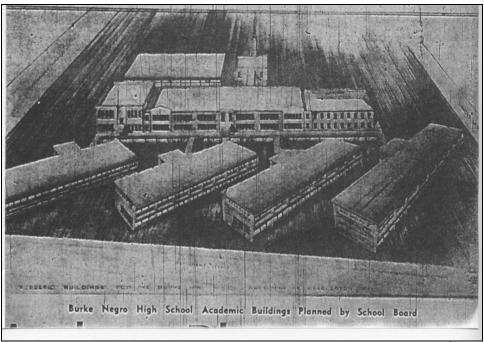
Architect's Model of New Burke High School showing campus plan. 56
